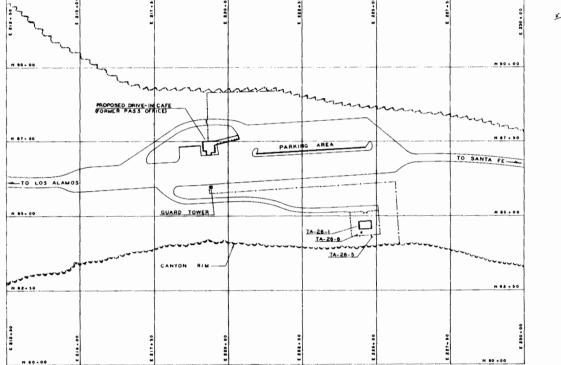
Structure Location Plan for TA-26 - D Site (1955 Drawing from the LANL Technical Area Structure Location Plans)
